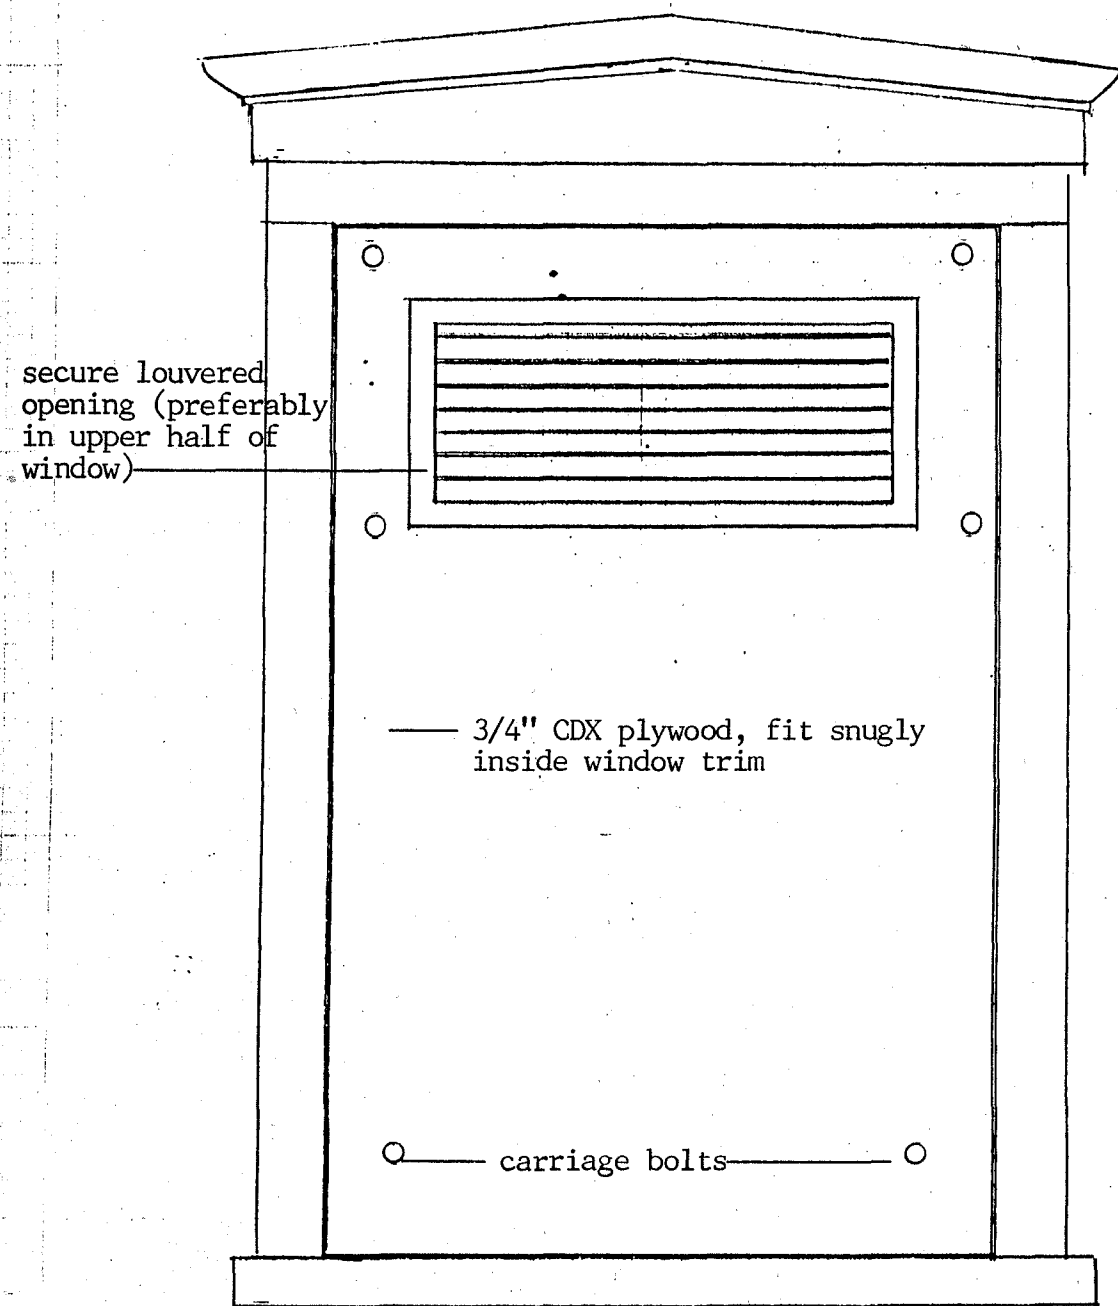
Elevation showing recommended window covering for first story. (Second story can have larger louver.) (BCB)
